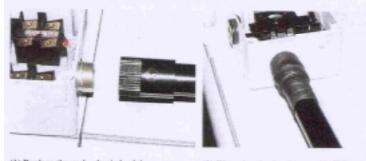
Flexible Conduit and TDI Trip Switch Junction Box (After Modification) 但片四 -- 軟性保護性管和单約配字跳脱開醫筆連接盒(修改後)
